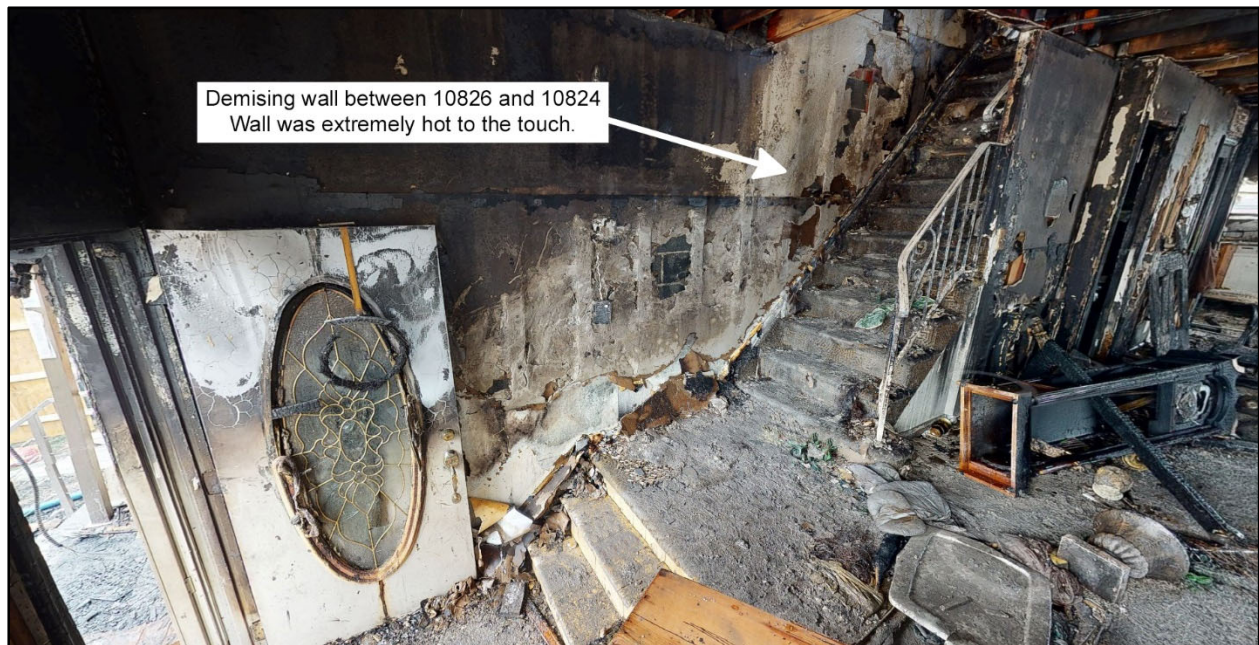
View of the front door and staircase on first floor of 10824 Avenue N.
